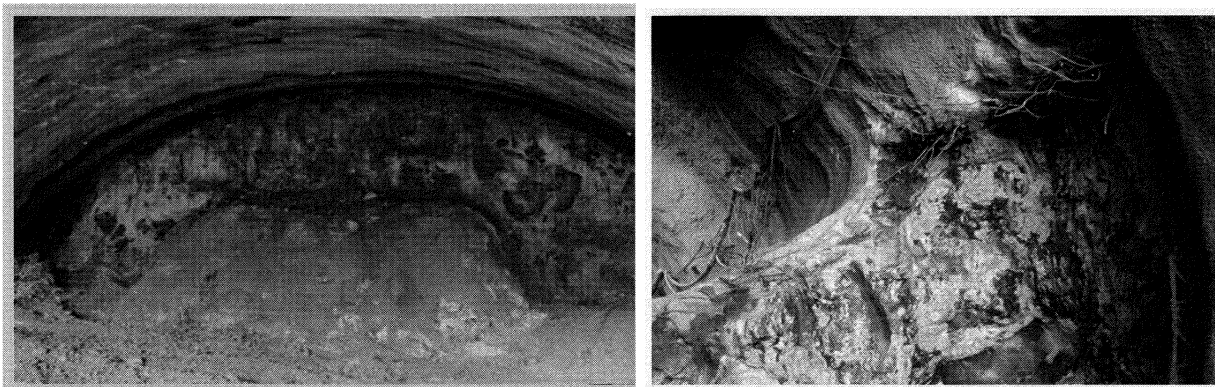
Top heading (a) face dumping, (b) temporary invert and enlarged footing
